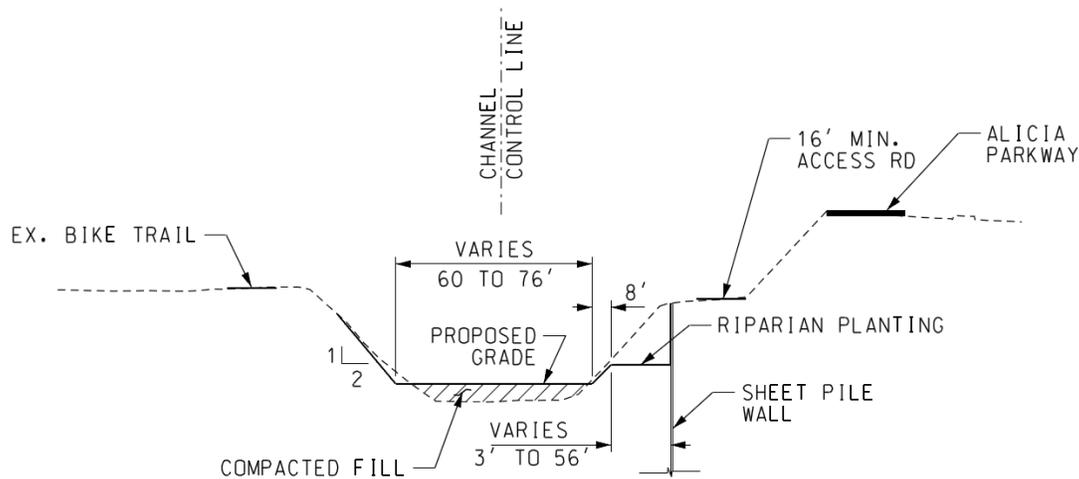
Typical Channel Widening near Aliso Creek Road Bridge
